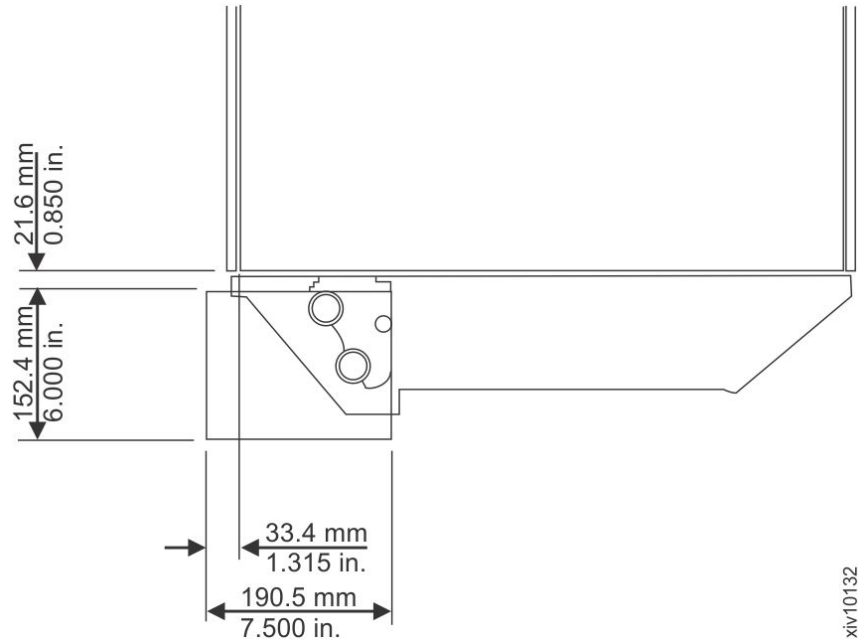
Raised-floor hose management example 2: tile cutout size and position
